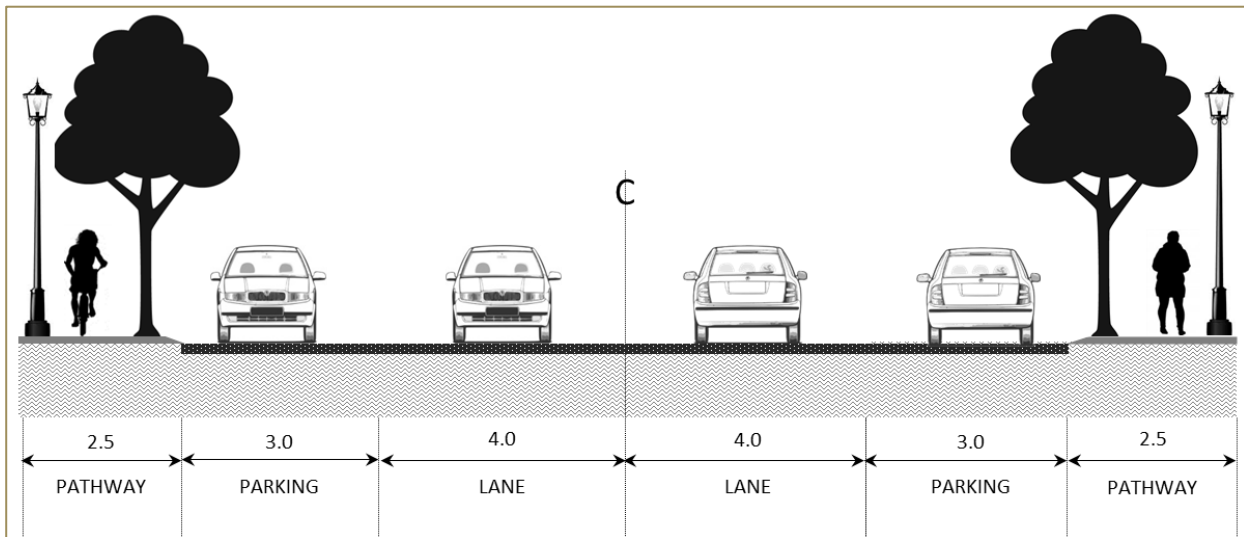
TYPICAL ROAD CROSS-SECTION
